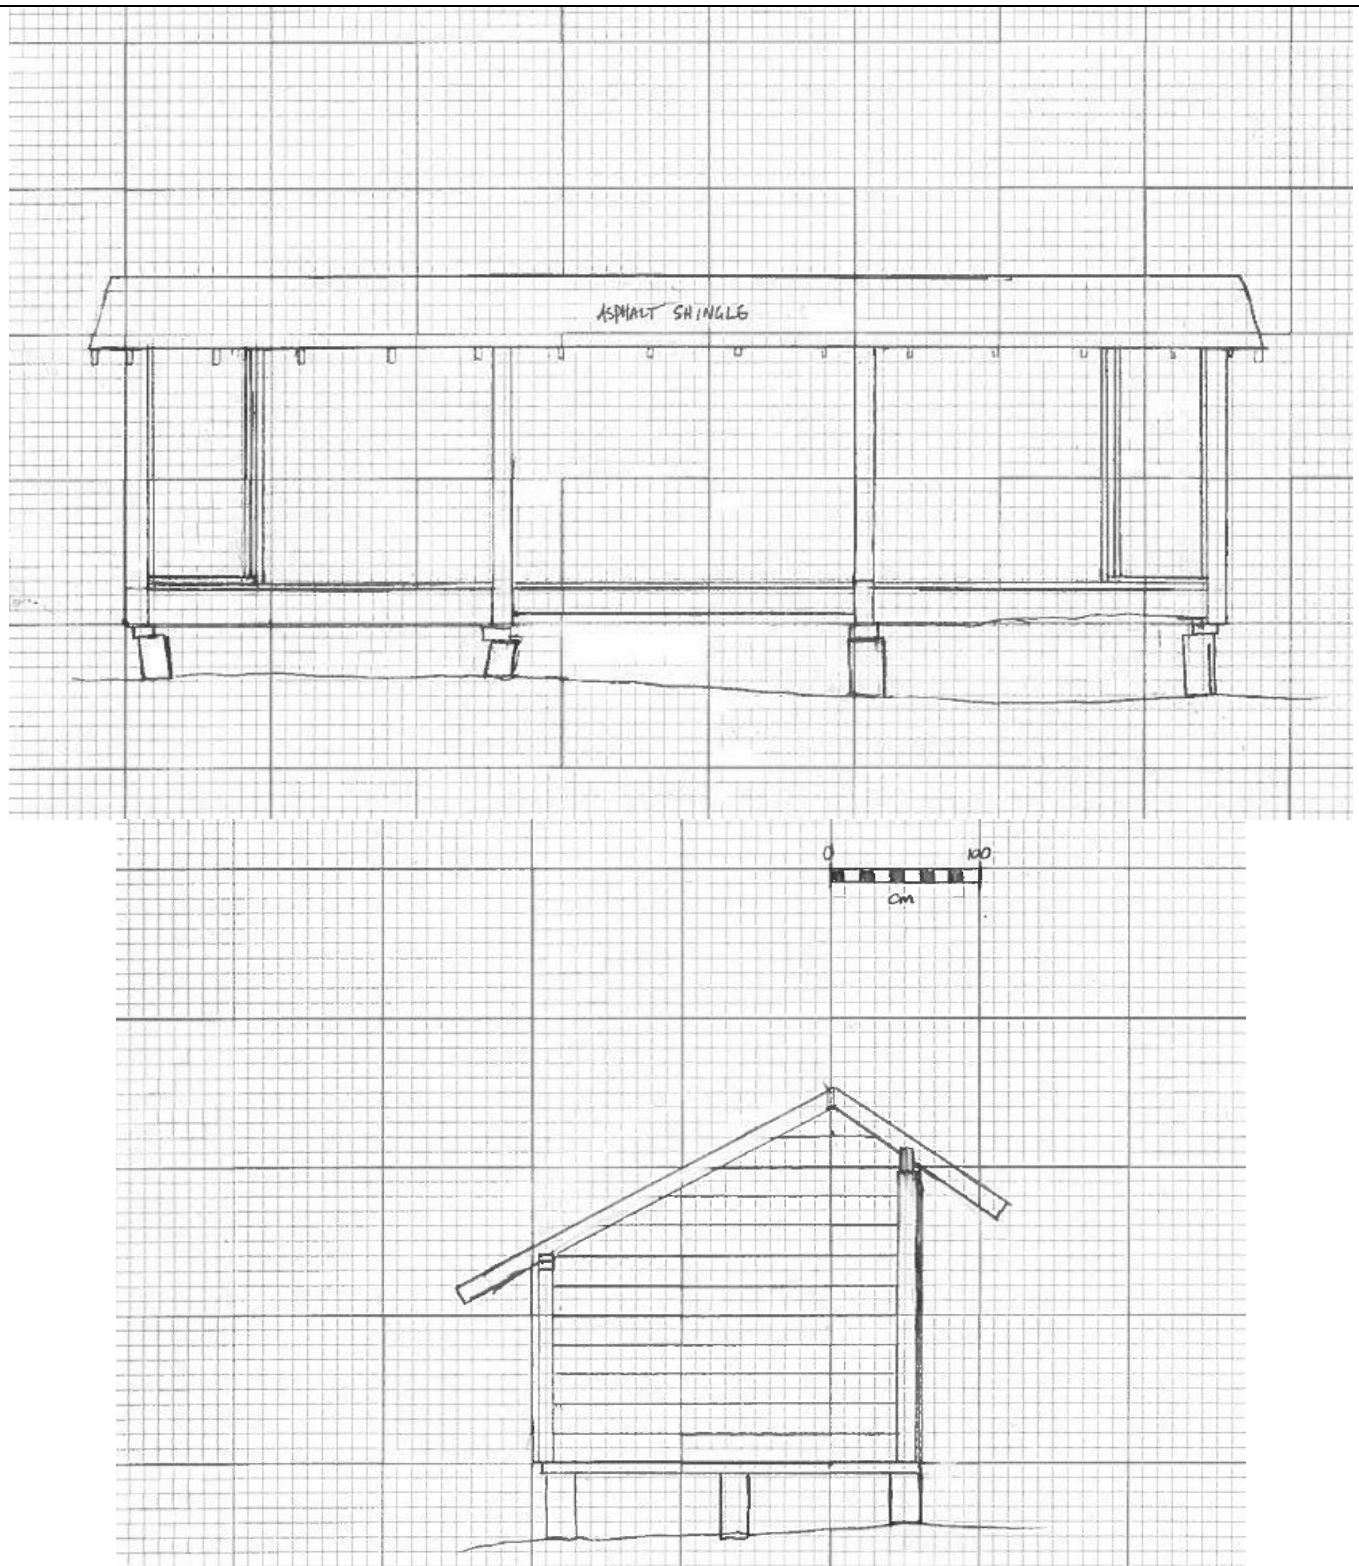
Three Ponds shelter drawings. Above: Northwest (front) elevation. Below: Northeast side elevation. October 21, 2011.
